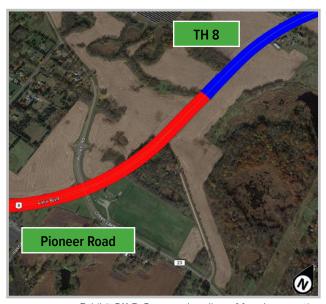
Proposed ending of four lane section east of Pioneer Road.
